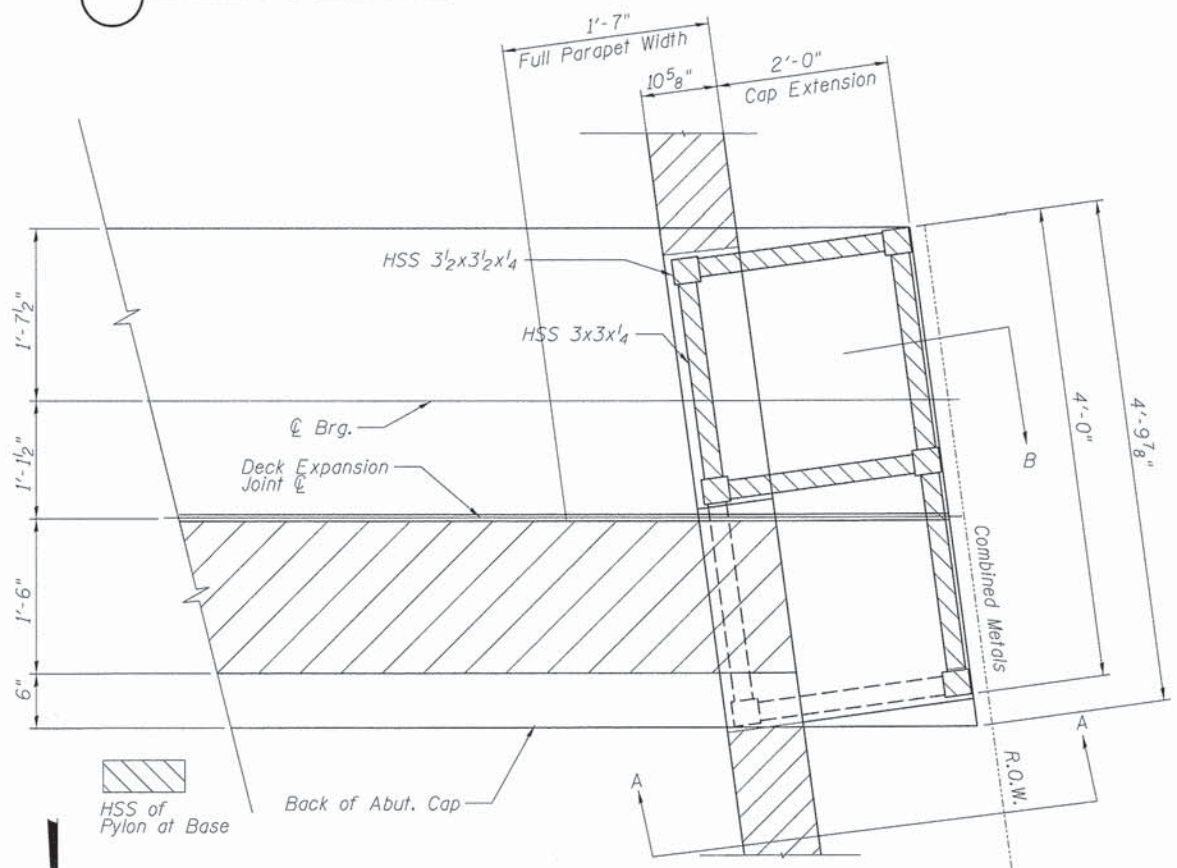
DETAIL B-ELEVATION DETAIL AT WEST PARAPET
